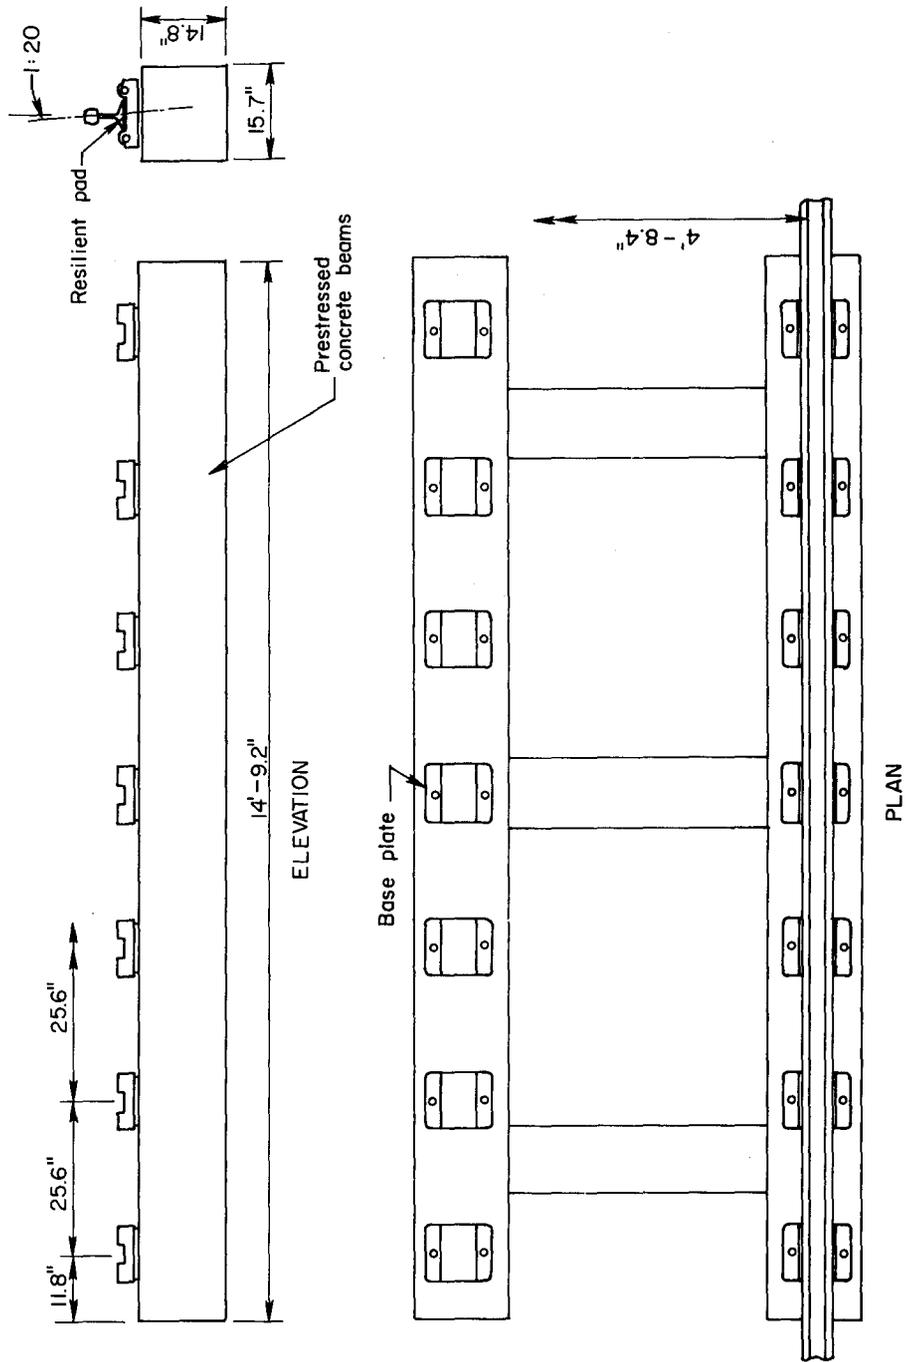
DETAILS OF TRANSITION BETWEEN SLAB TRACK AND CROSS TIE TRACK
